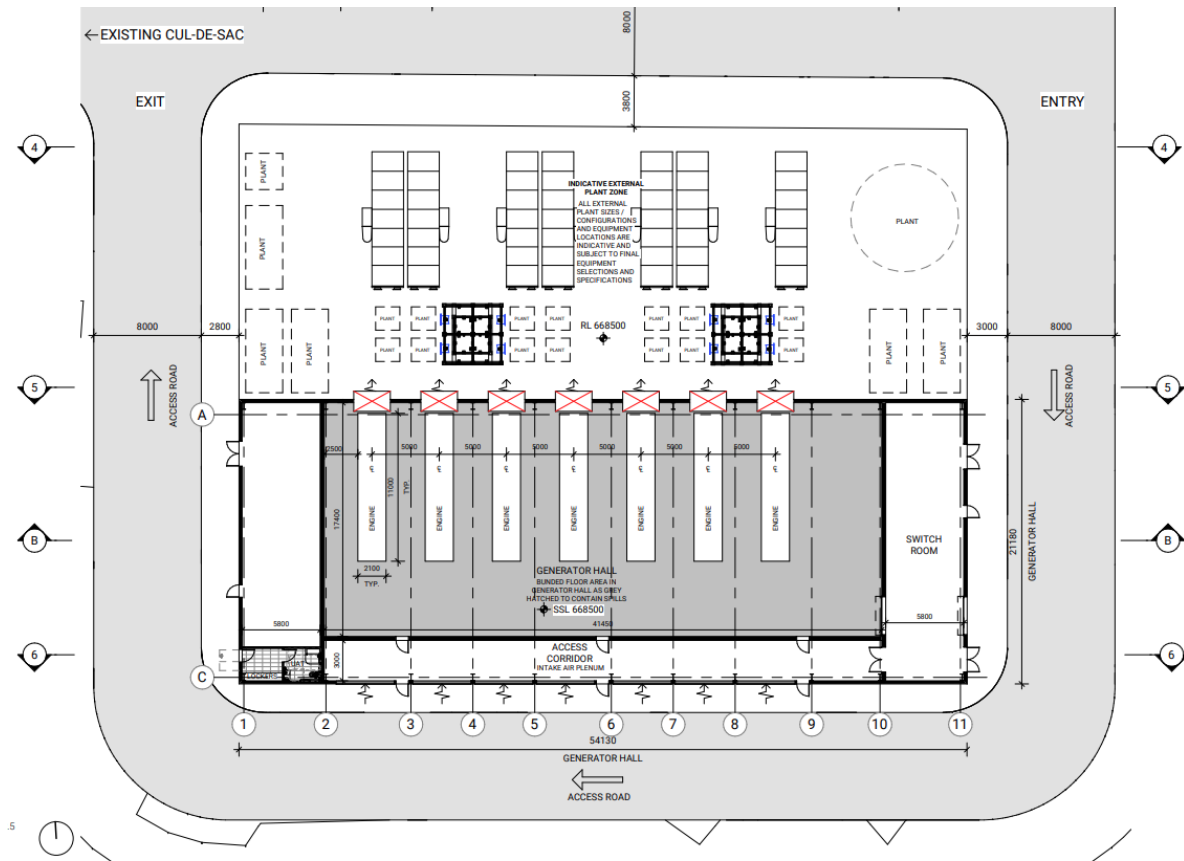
Proposed Gas Power Generator (SQE2) Floor Plan
